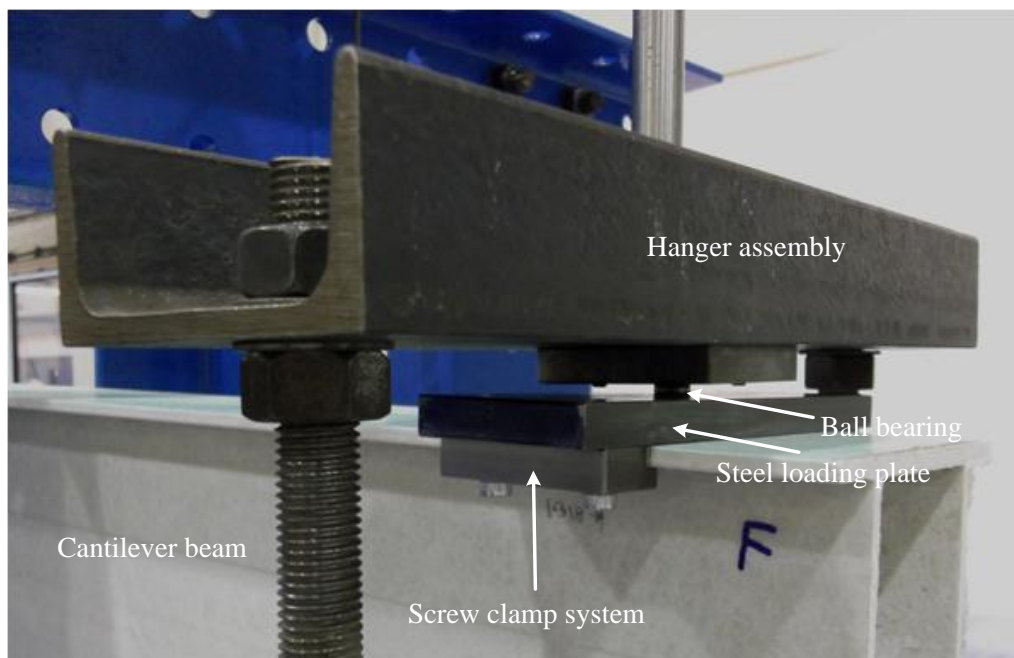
Local fixture to ensure point load is applied through the shear centre of the beam section.
